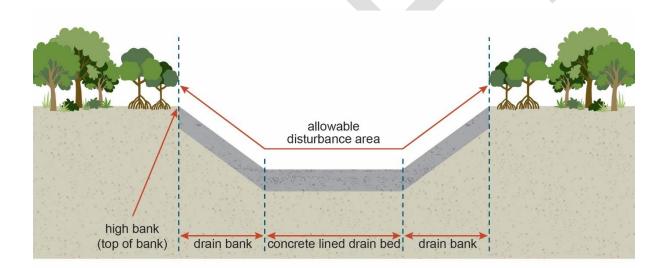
Constructed drain with both banks and bed lined e.g. concrete
